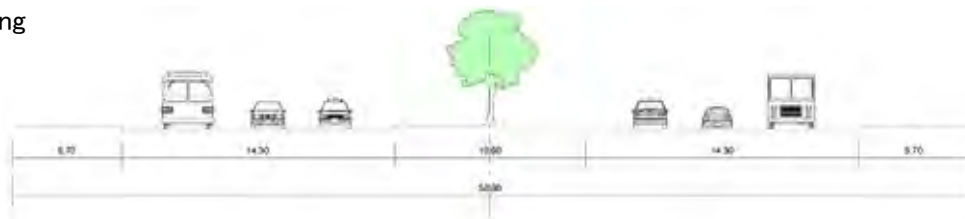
Existing and Planned Cross Sections on Av. Almirante Barroso (2)
